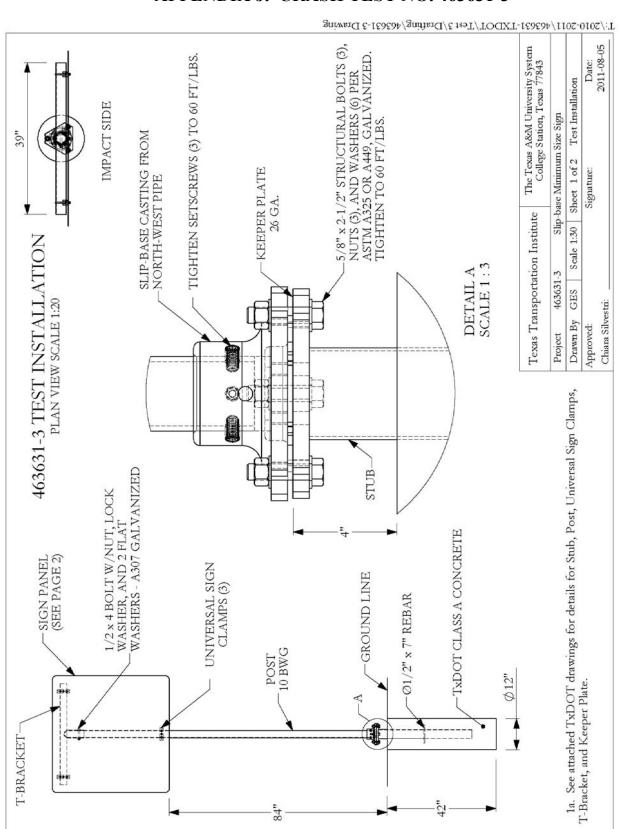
Details of the 10 BWG Steel Support with 14 ft² Sign.
